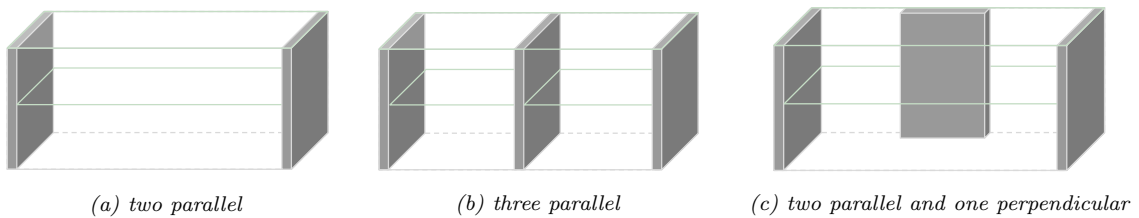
Building blocks with various wall arrangements including floor stiffness
